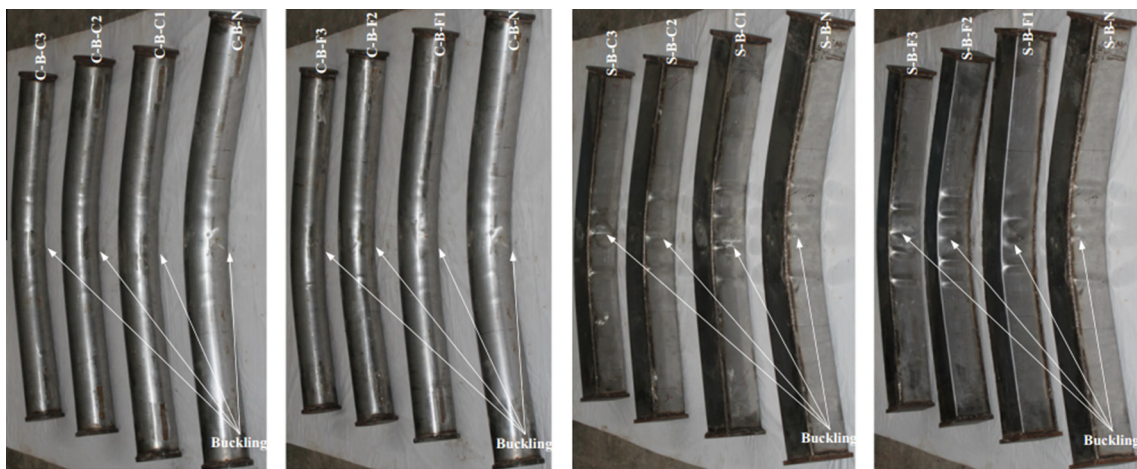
Failure modes of RAC-filled stainless steel tube beams (Yang and Ma [23]).
